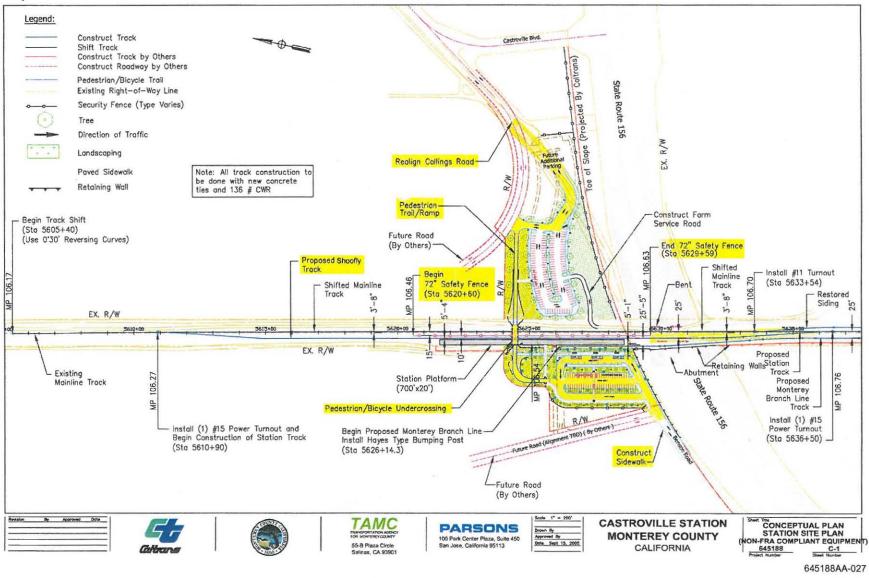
illustrates the conceptual plan for expansion option 17. A parking structure is assumed (see Figure 3-12) as there will be no need to acquire lands to the west for a track connection to a Caltrain layover facility.
